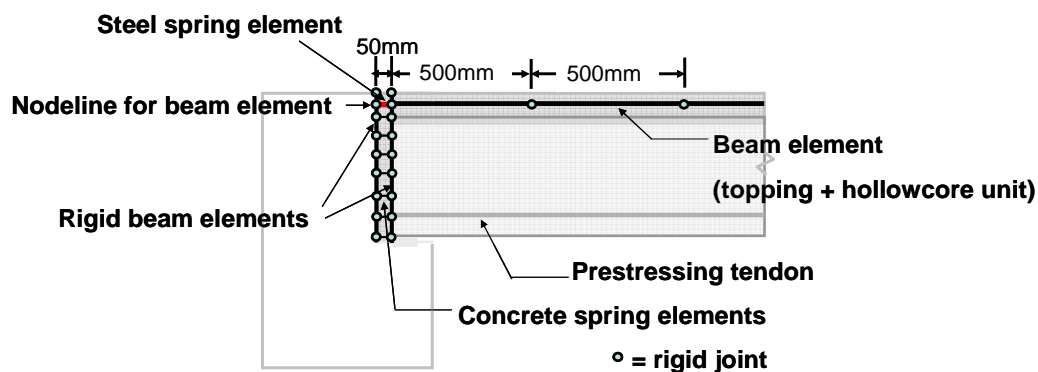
Schematic of multi-spring connection model for Matthews' detail
